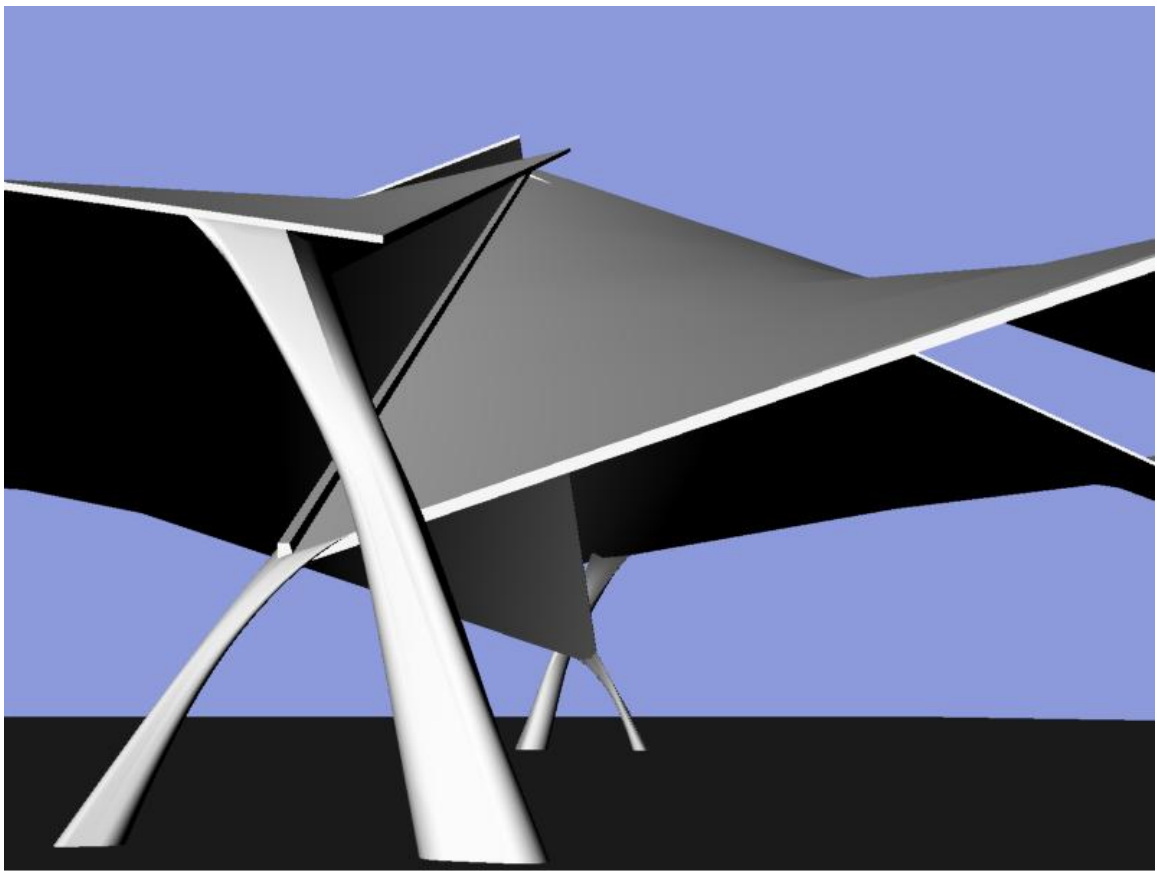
A rendered view of the structure showing the top lip on the interior shell, stopping rain from running off the roof inside the roof.
